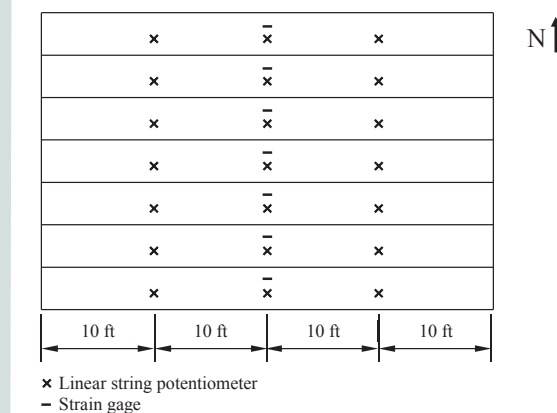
Instrumentation plan. Note: 1 ft = 0.305 m.
